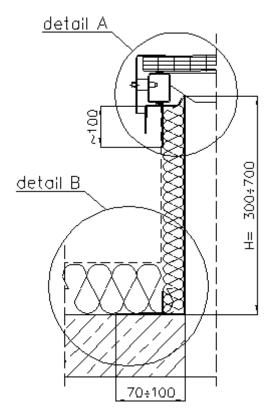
Placement of steel base on the roof (DETAIL B) and method of sealing with roof membrane or roofing paper (DETAIL A).
